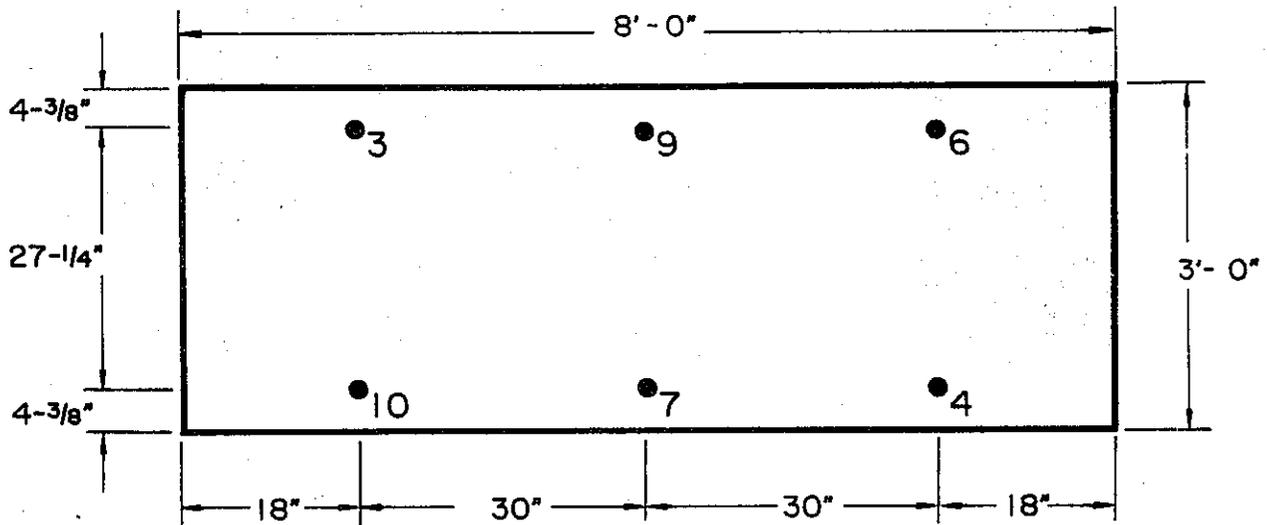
Plan view of slab used for Test Series 1 showing anchor locations.
